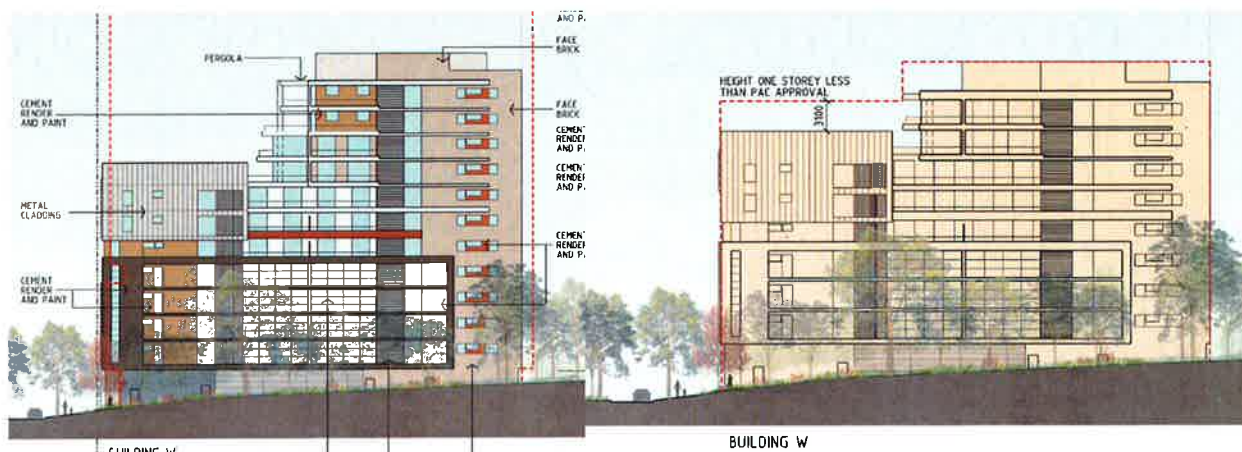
The South elevation of Building W / the Perth Building as approved in the Concept Plan (subject to modification) (above) and in Modification 1 (below)
